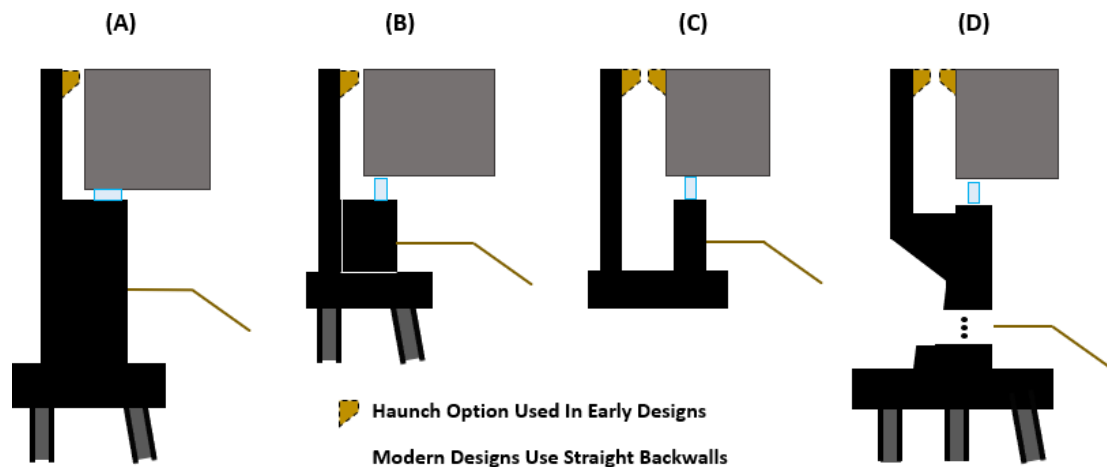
Conceptual illustration of alternative seat-abutment designs used in California box-girder bridges: A) stem wall support, B) pedestal support, C) free wall support and D) cantilever. (Roblee, 2020e)
